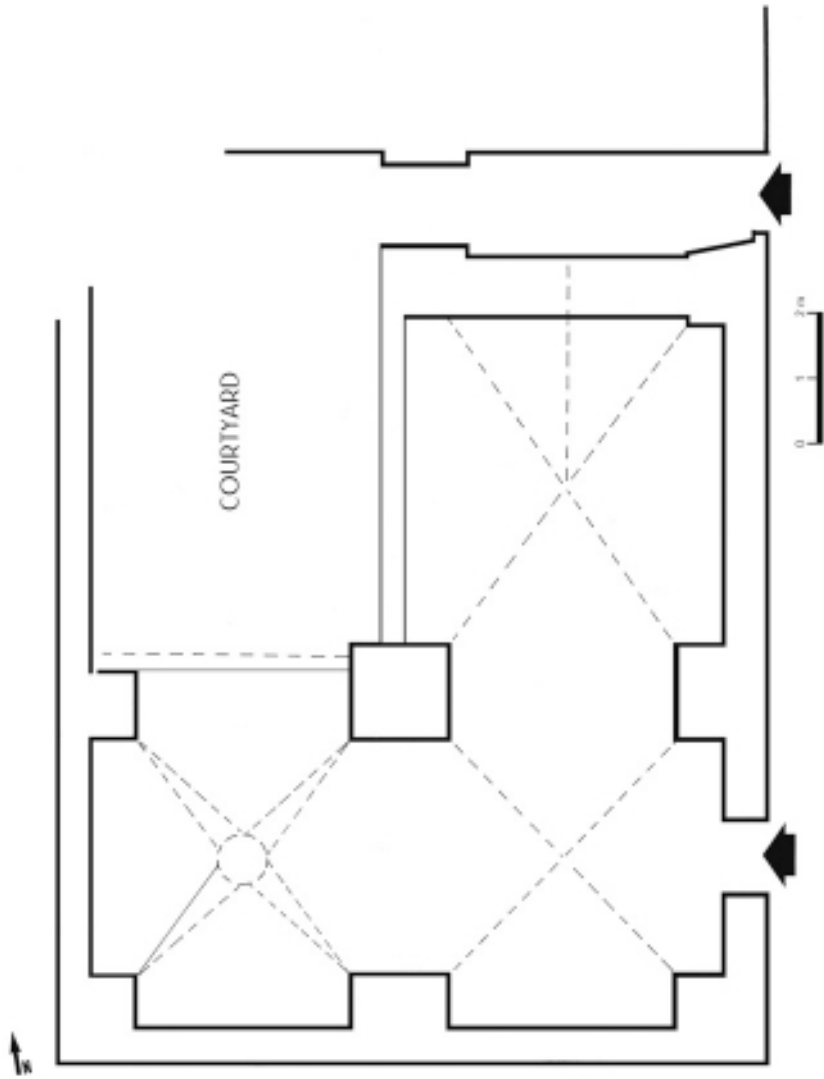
Plan of house with courtyard in Acre (House 1:4) (drawing by author).
